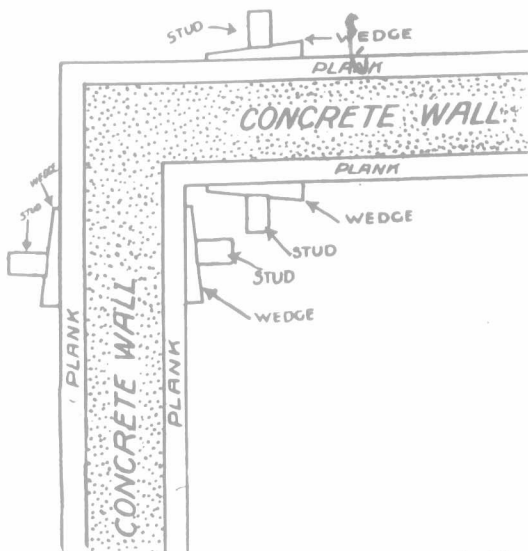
Corner Concrete Wall. Showing planking and supports. Two bevel wedges at each stud, one at top, other at bottom of plank.
